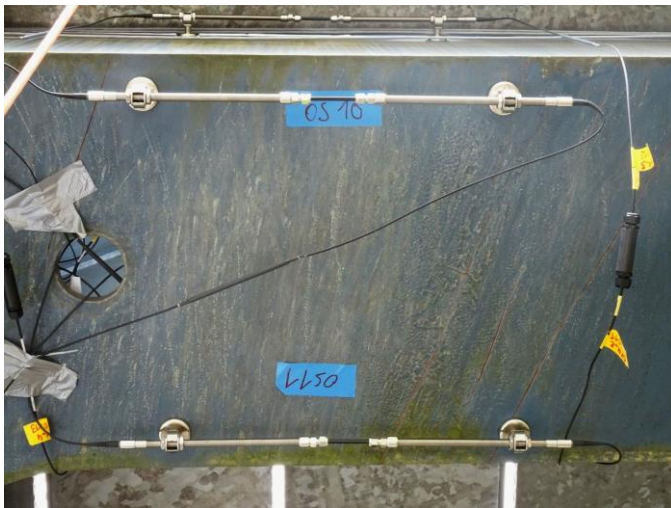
Fibre-optic strain sensors mounted using magnets and threaded extension rods.
